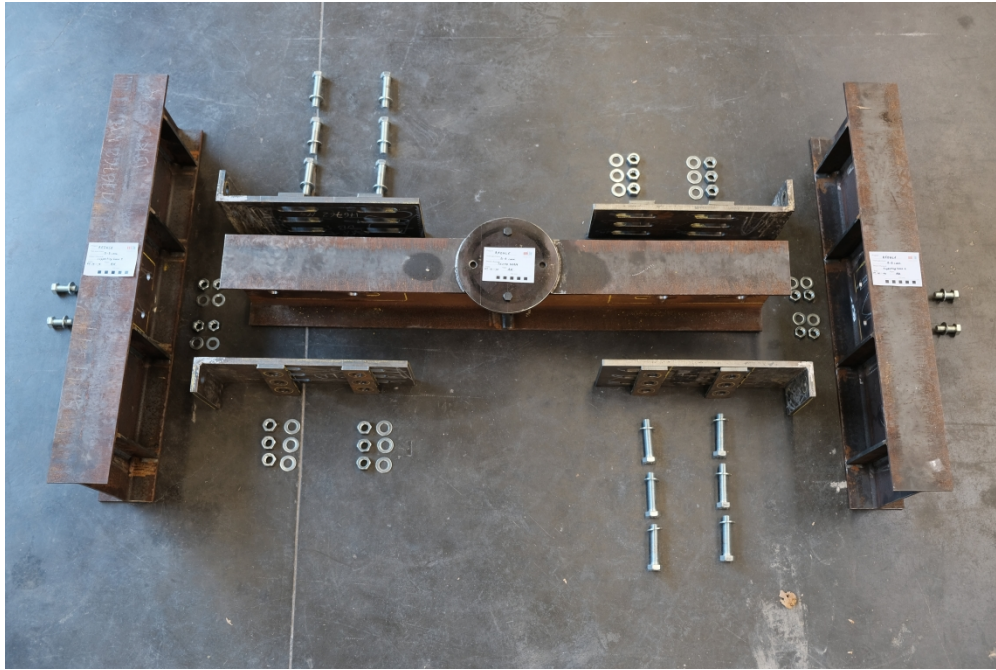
Photo shows a kit consisting of a steel beam and connecting elements (the two primary beams are excluded in the kit)
